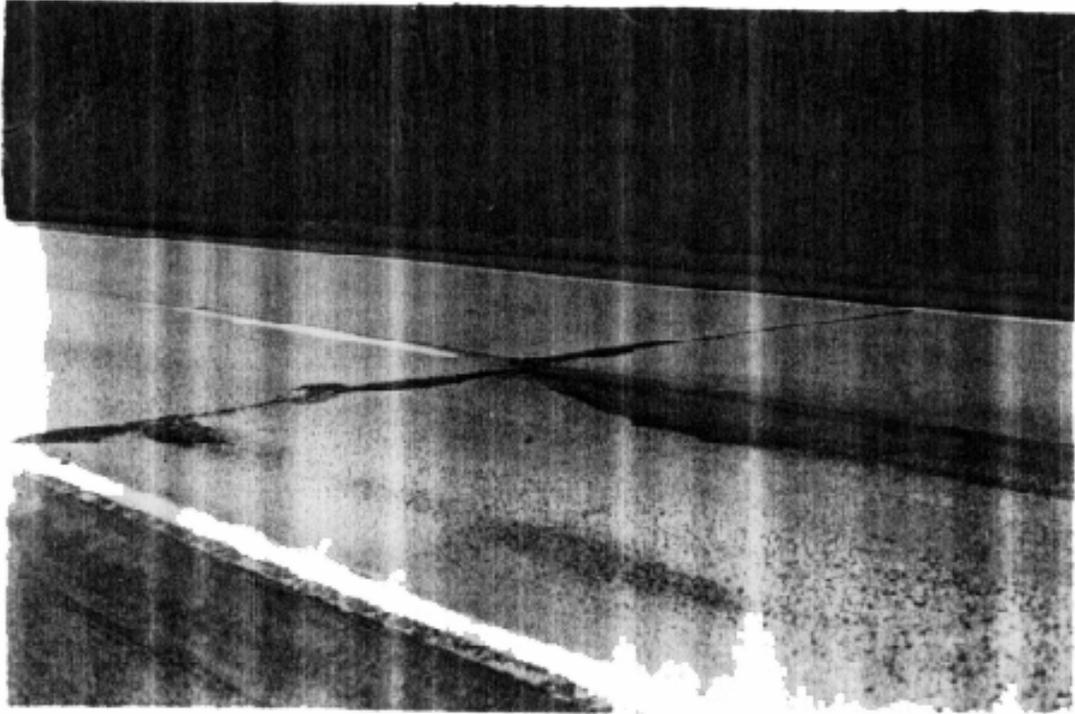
Water Pumping from Transverse Joint of Concrete Pavement
